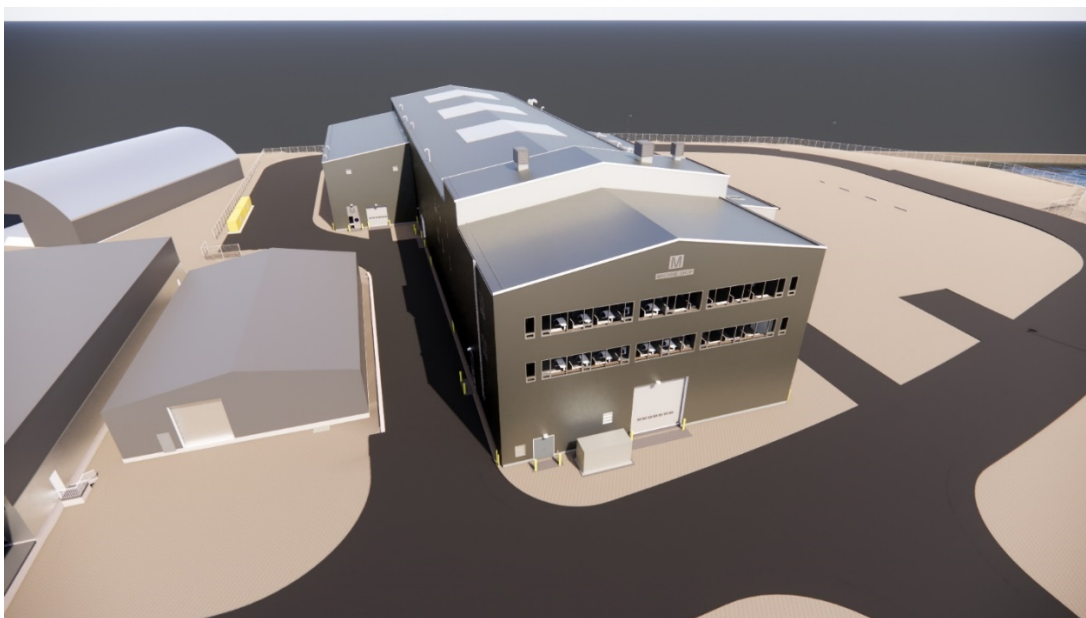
MULTI-PURPOSE MACHINE SHOP BUILDING EXTERIOR NORTH ELEVATION
